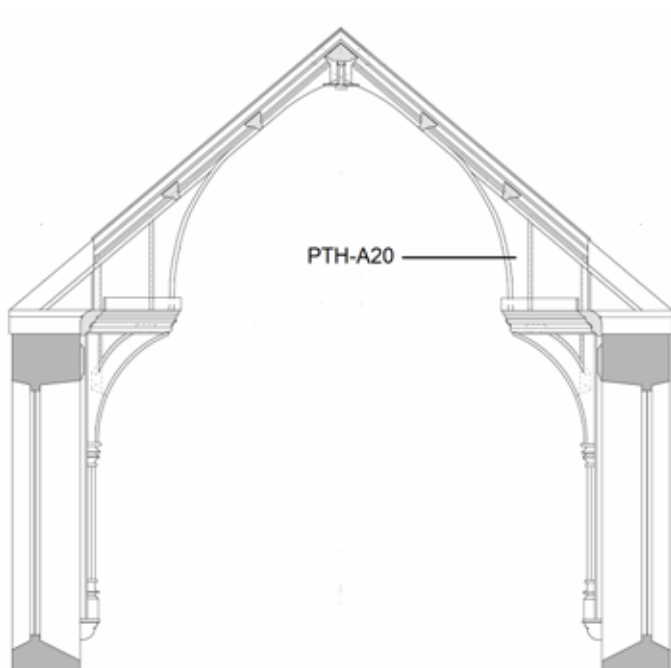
Nave roof, truss CD, showing the location of sample PTH-A20 (Nicholas Warns Architects Limited)
